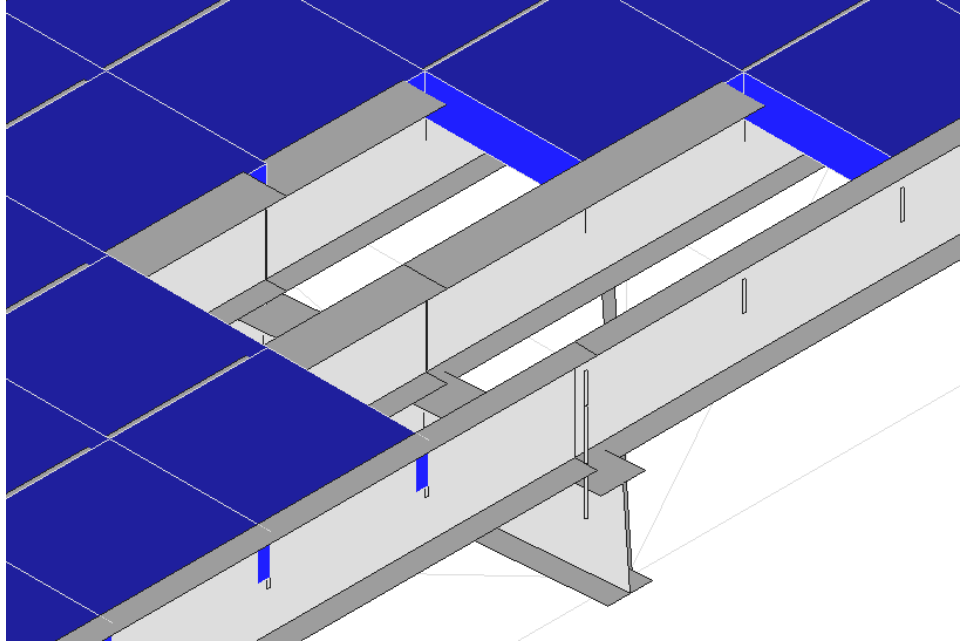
San Miguel Bridge: Rendering of floor beam, stringers, and deck. Note that the deck is represented as centered on the top flange of the stringers, intended to approximate the actual roadbase material, which envelops the stringer top flanges.
